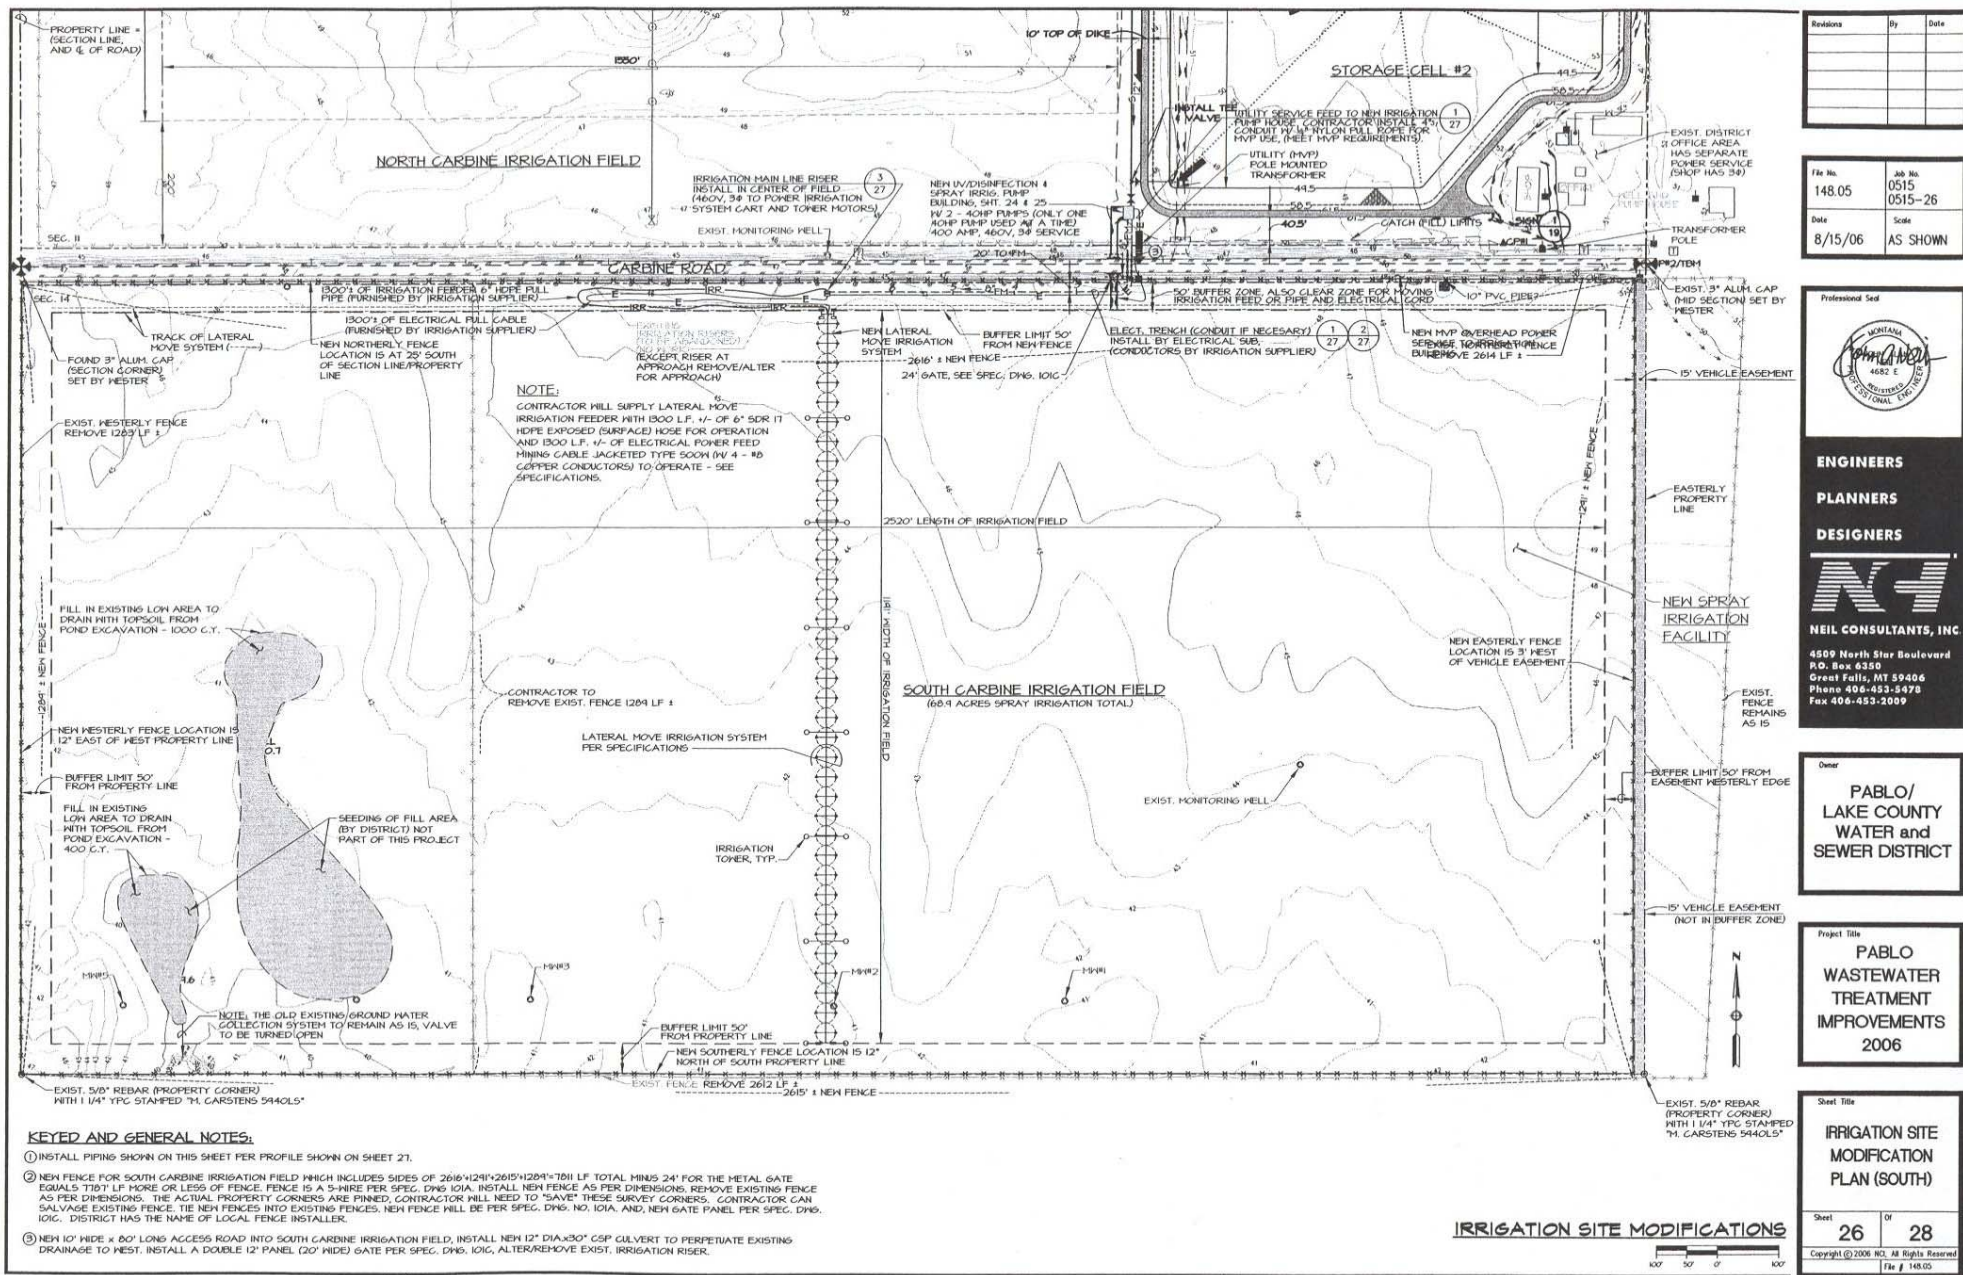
Proposed Wastewater Treatment Improvements/Modifications (South of Carbine Road)
